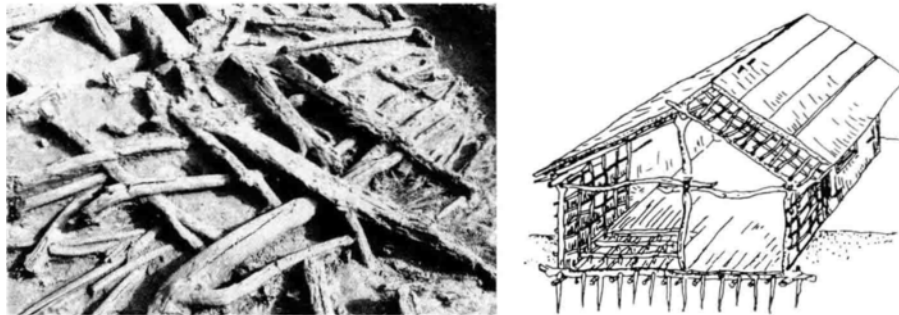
The Twelve Bridge Building Site (left) in Chengdu and the recovery picture (right)
